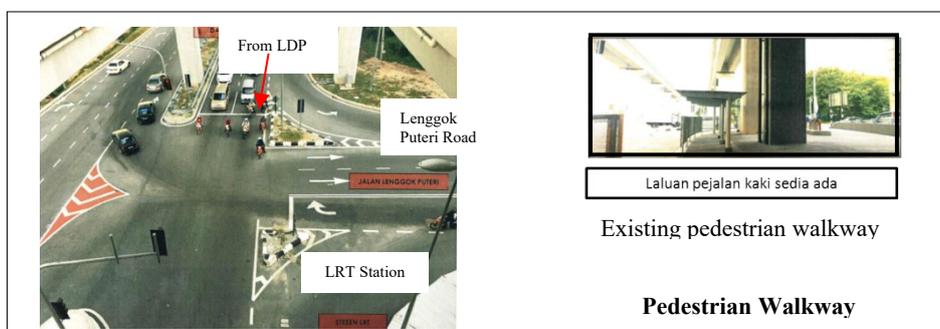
Pedestrian Walkway Facilities at the LRT Station
